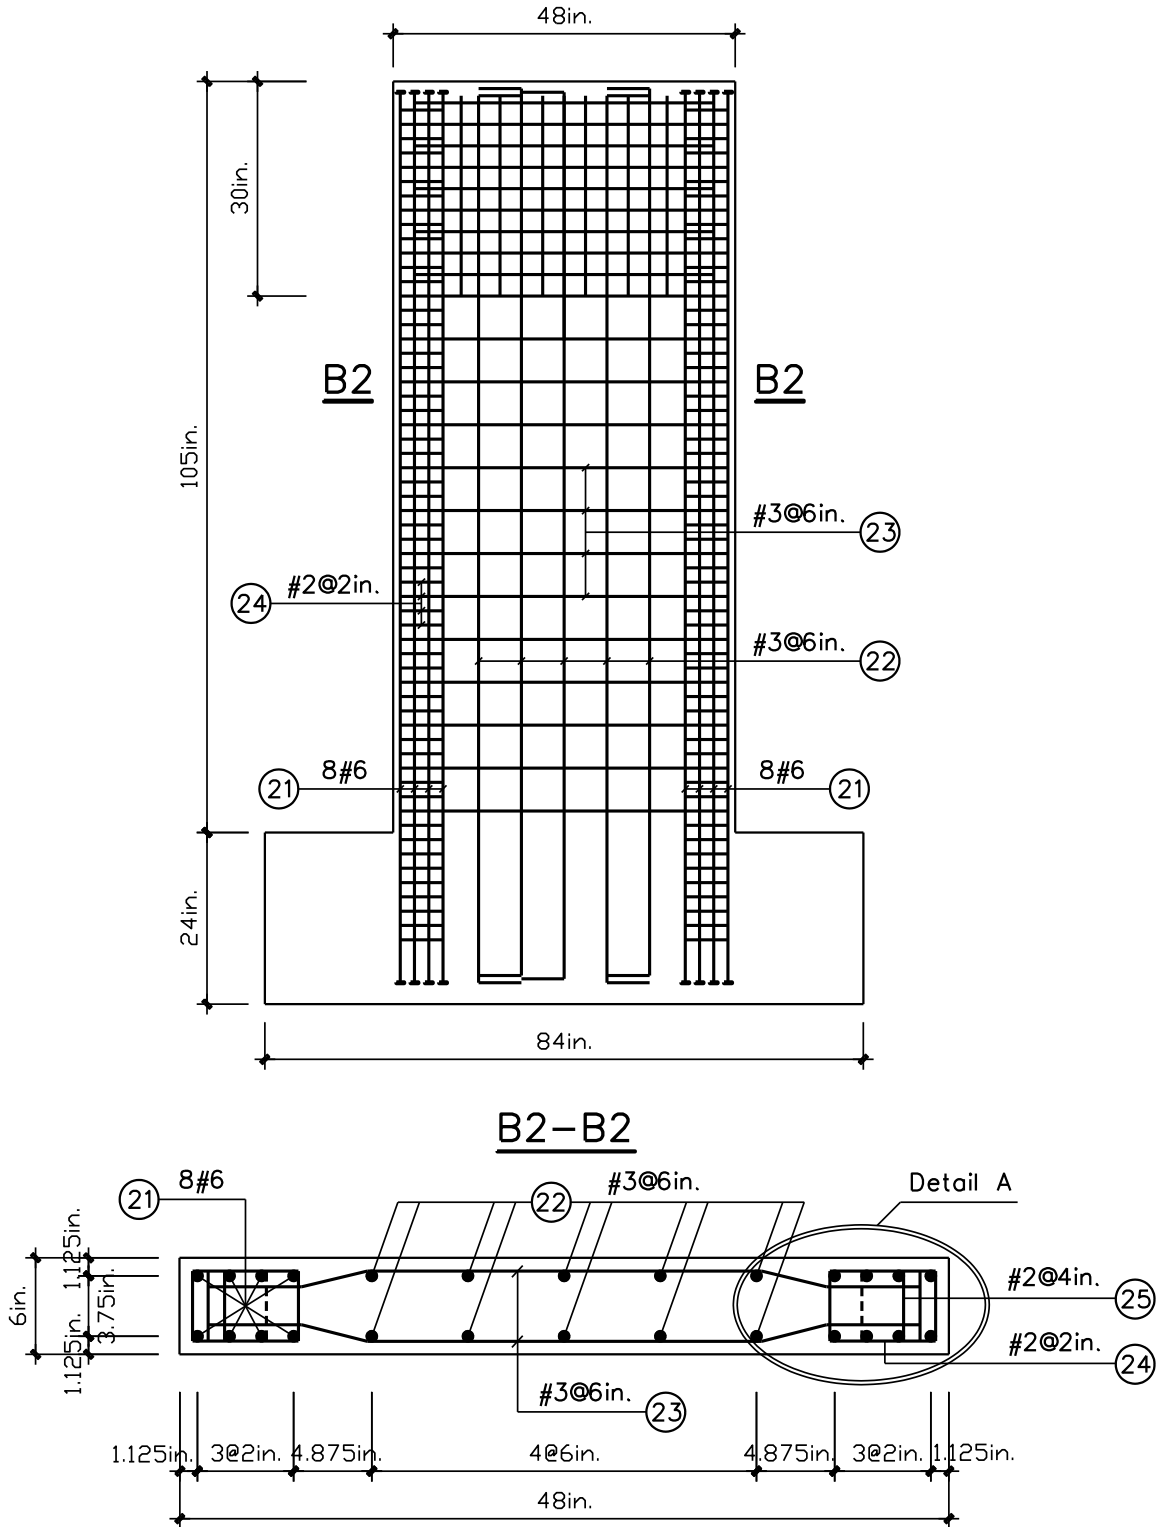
Reinforcement details for RW-A20-P10-S63
